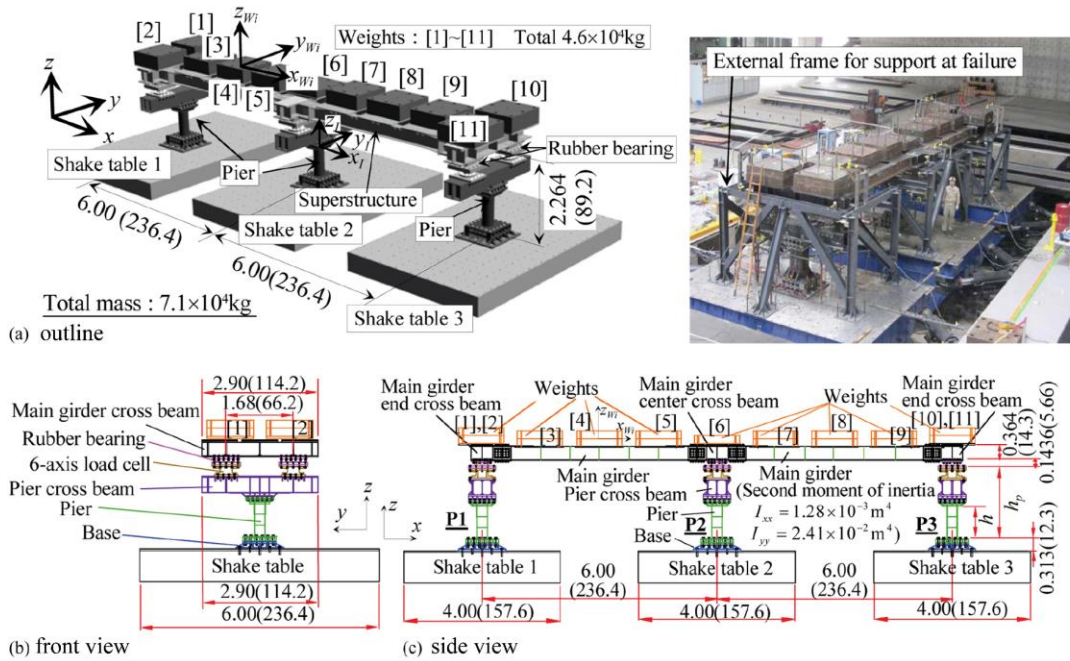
Two span elevated girder bridge model used in the shake table test (Goto et al. (2017))
